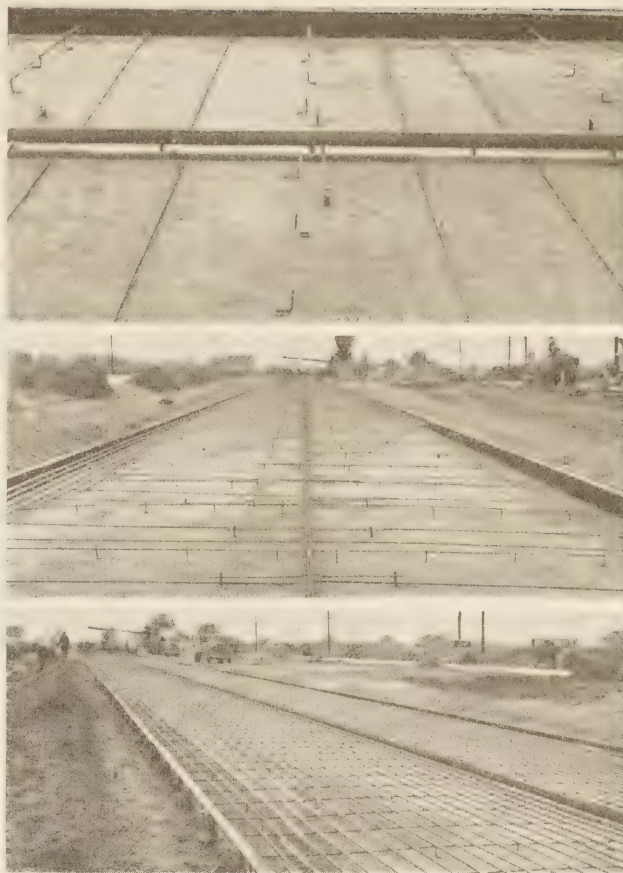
INSTALLMENT OF HEAVY BAR REINFORCEMENT. TOP, WELDED CHAIR SUPPORTS AND TRANSVERSE BARS BEING PLACED; MIDDLE, LONGITUDINAL AND TRANSVERSE STEEL BEING PLACED; BOTTOM, HEAVY BAR MAT REINFORCEMENT IN PLACE.
